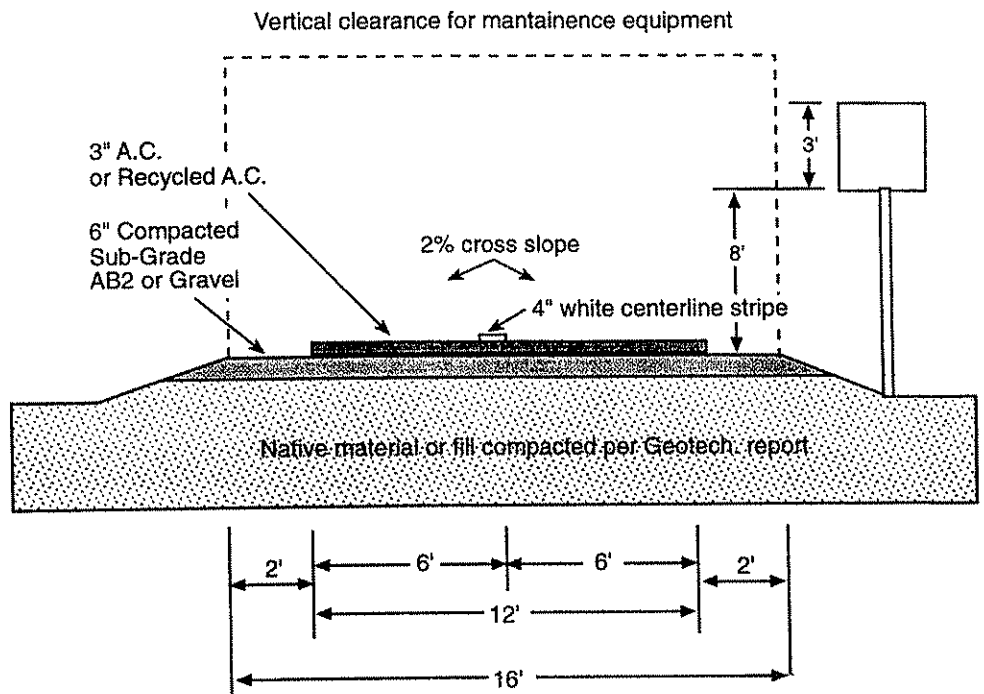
Class I Bike Path Cross Section	 <p>alta PLANNING • DESIGN • CONSTRUCTION</p>
